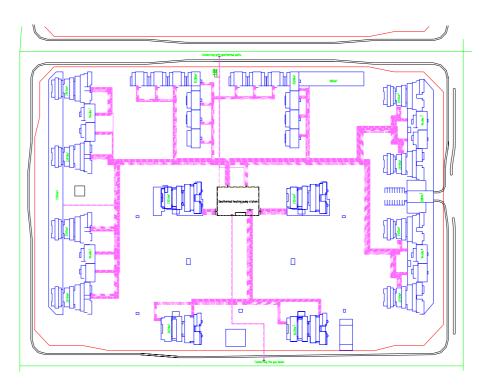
The centralized heating system piping network (Xie Donghui,
